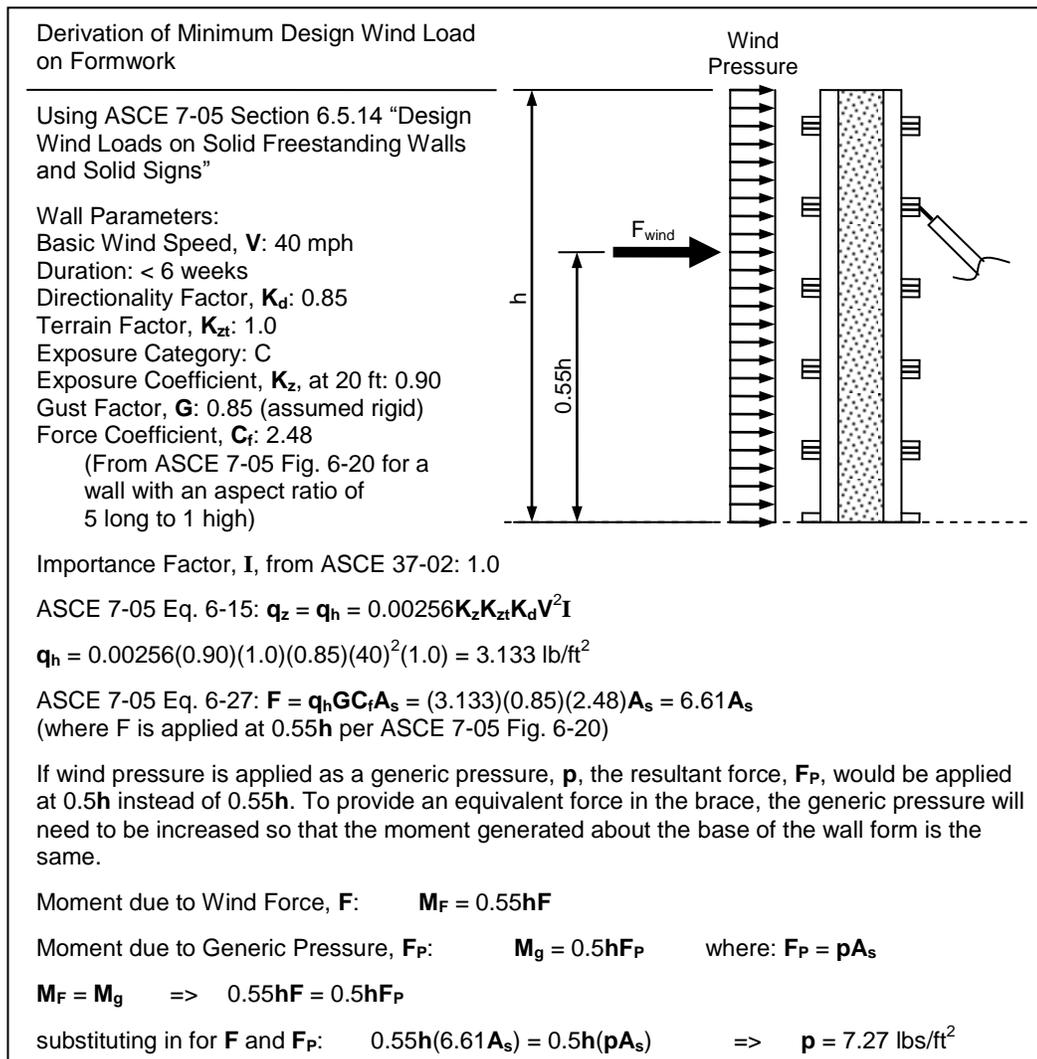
Derivation of a Work Wind Load on Formwork
